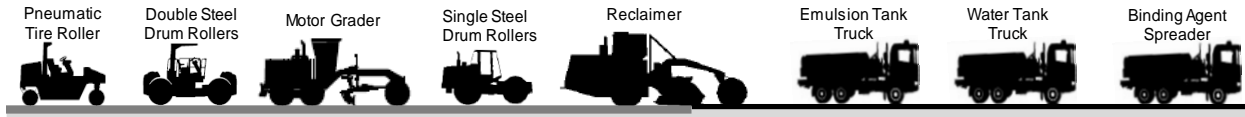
Typical Equipment Train for Pavement Recycling using FDR with Emulsified Asphalt and Cement Additives.
